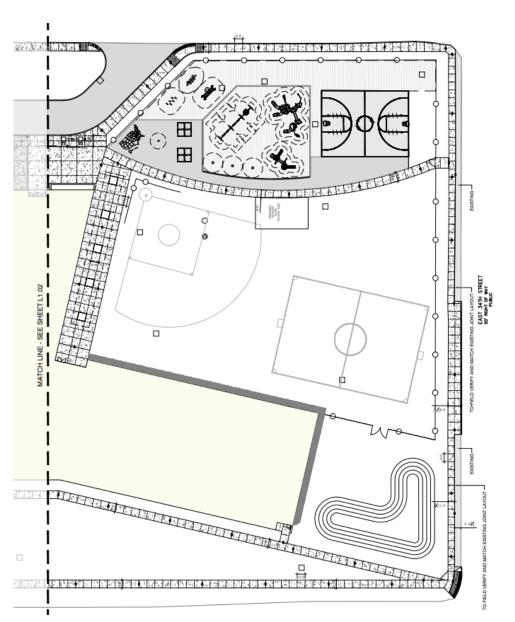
Enlarged view of the proposed playground and fence on the south side of subject site.
